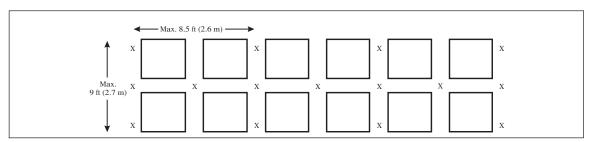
Plan view of alternative in-rack sprinkler arrangement for double-row racks up to 9 ft (2.7 m) deep
